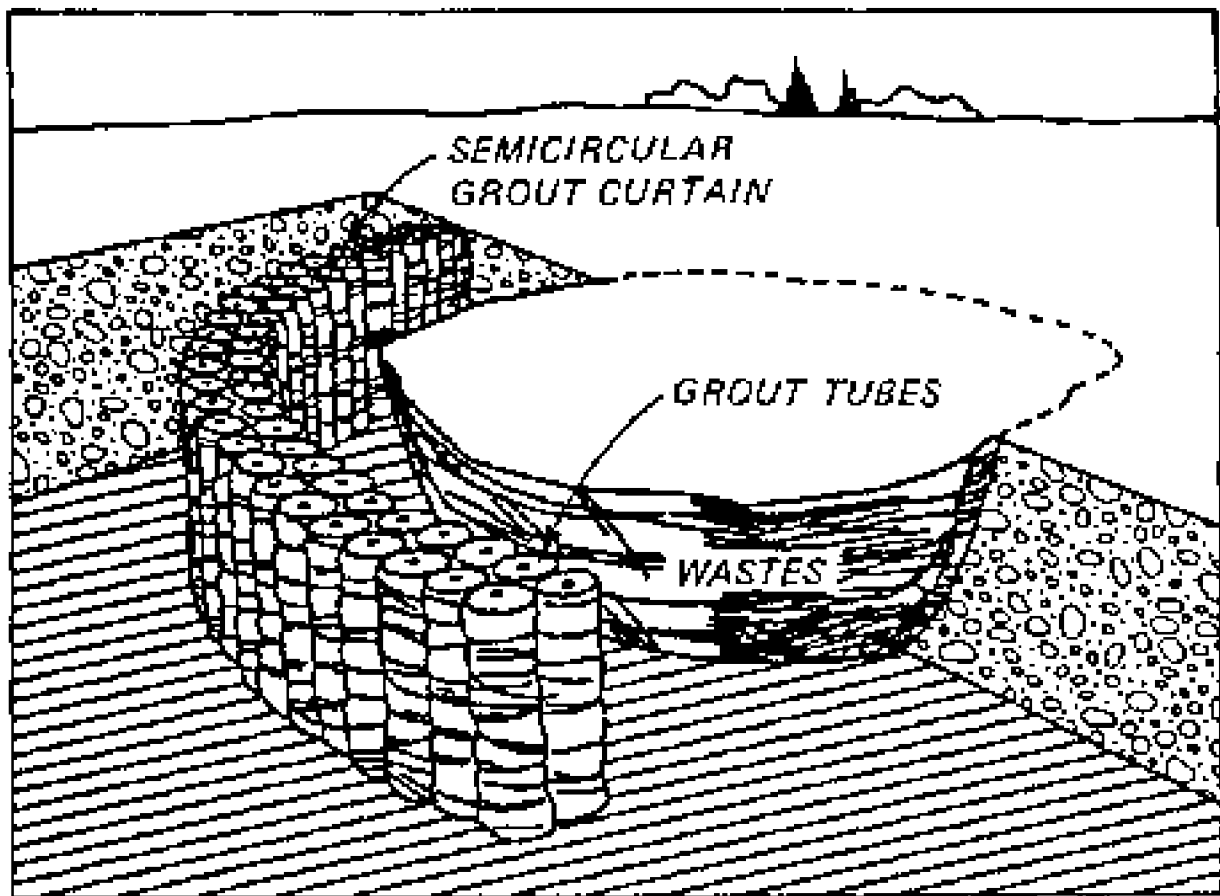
Semicircular Grout Curtain Around Waste Site
